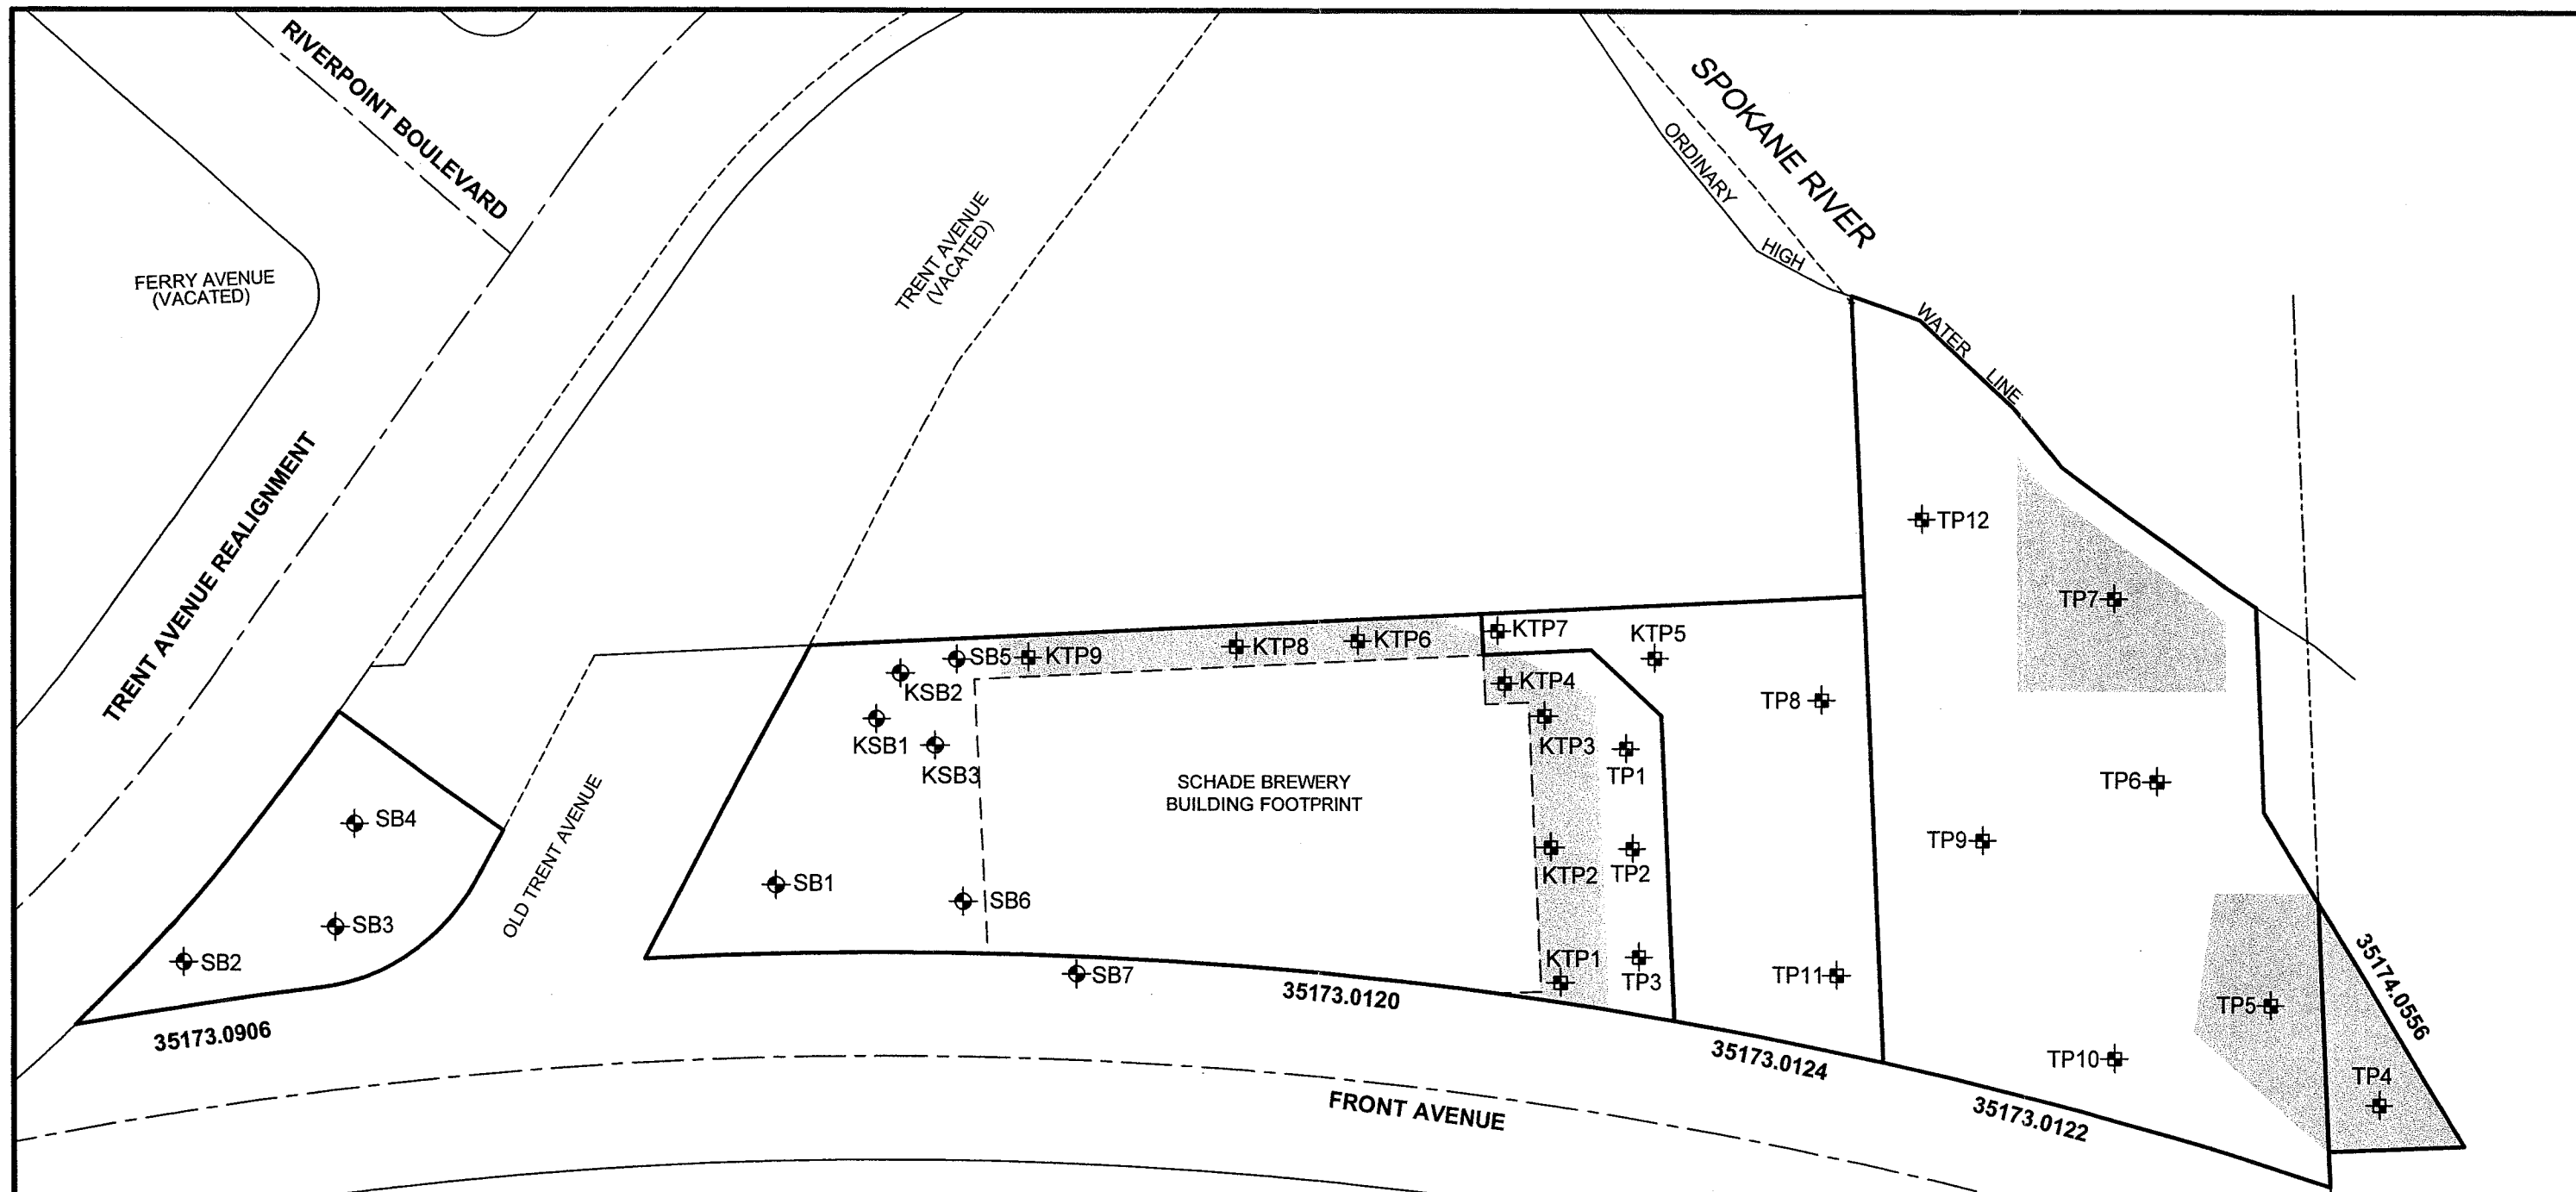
Cleanup Action Plan PETROLEUM HYDROCARBON AFFECTED SOIL American West Bank Schade Brewery and Adjoining Parcels Spokane, Washington
